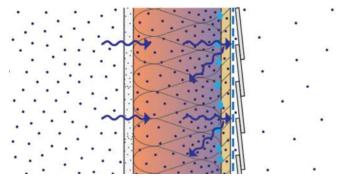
Vertical Section through Insulated 2x6 Wall with Vapour Barrier on Outside of Sheathing
